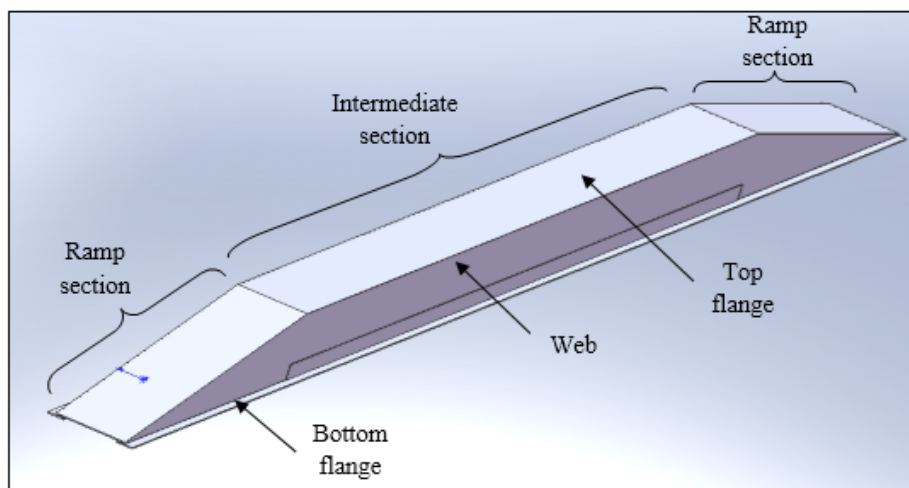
Illustration of the proposed bridge girder (Azrul, 2014).
